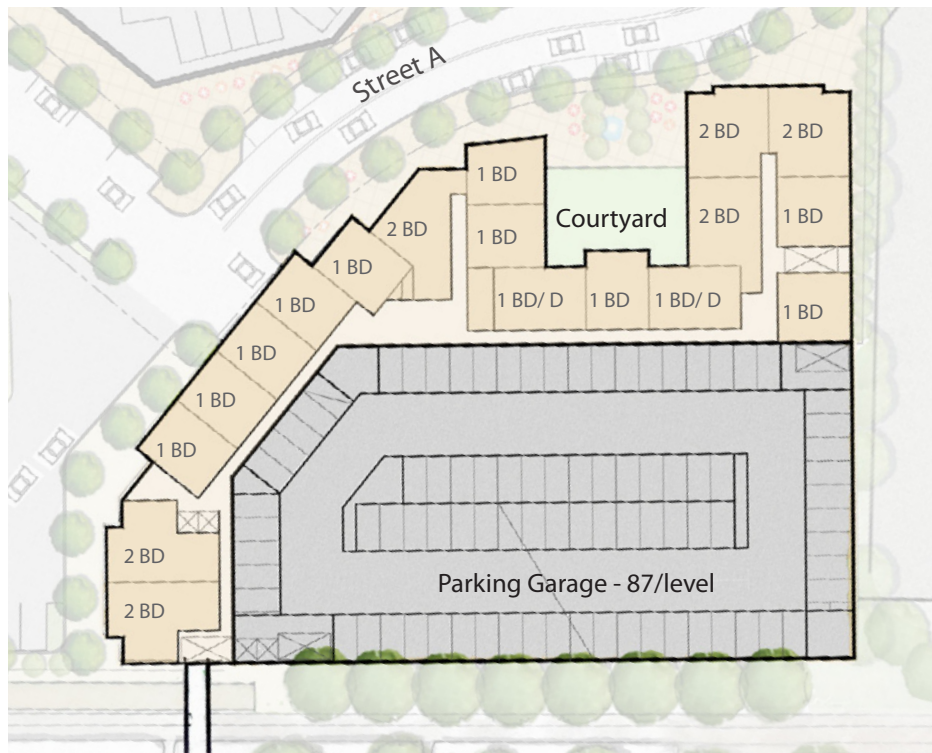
Typical Level Plan - Residential Units and Parking
